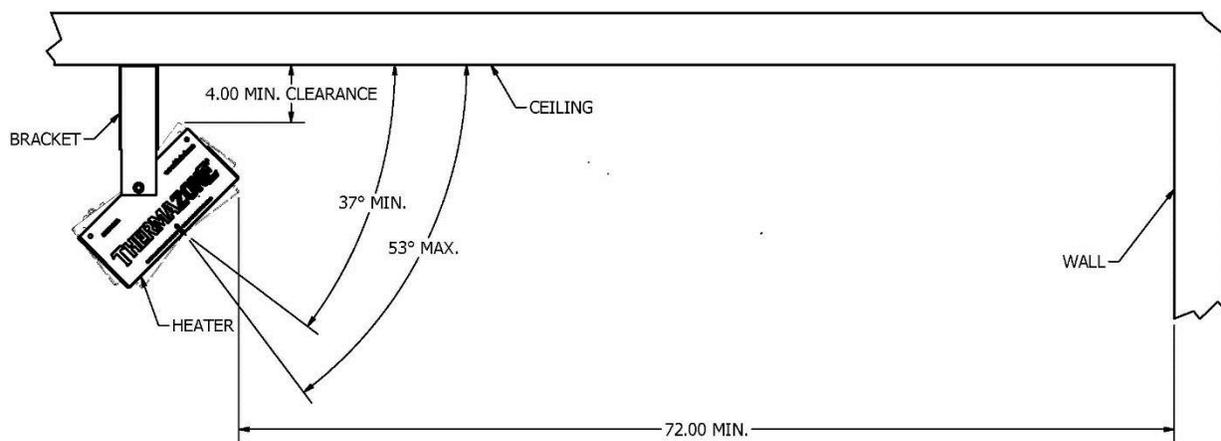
CEILING MOUNTING ANGLED TOWARDS VERTICAL SURFACE
